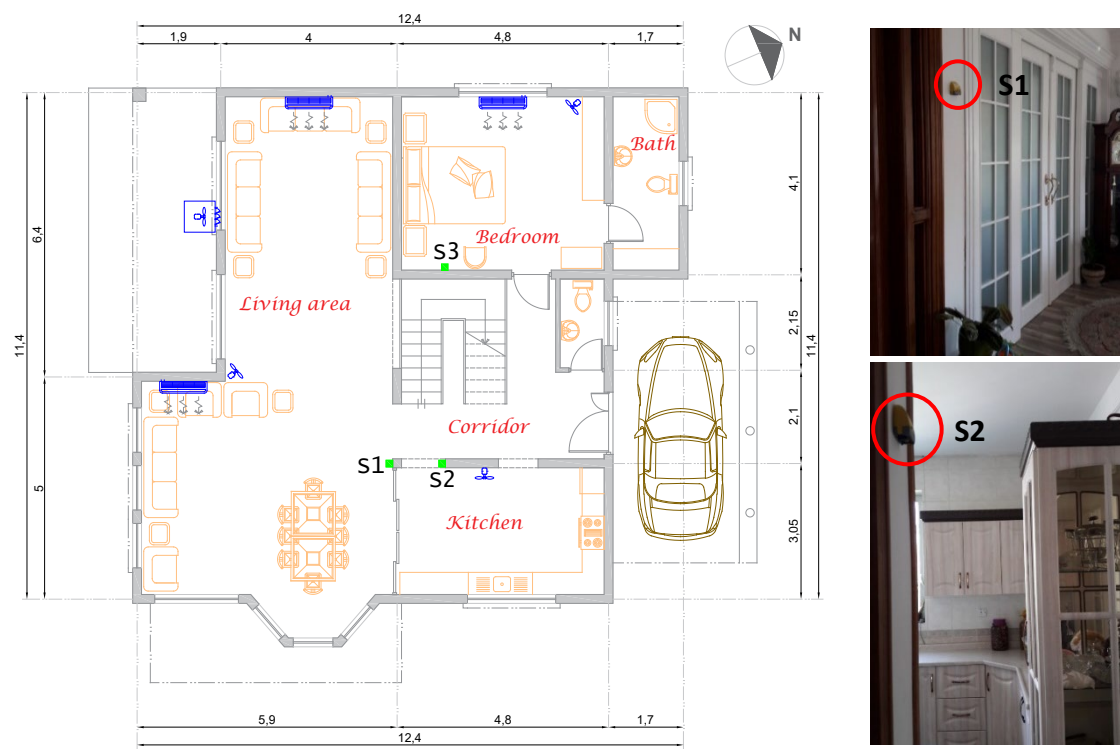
Ground floor plan (left) and views of two monitored spaces (right) showing the location of data loggers (author)
